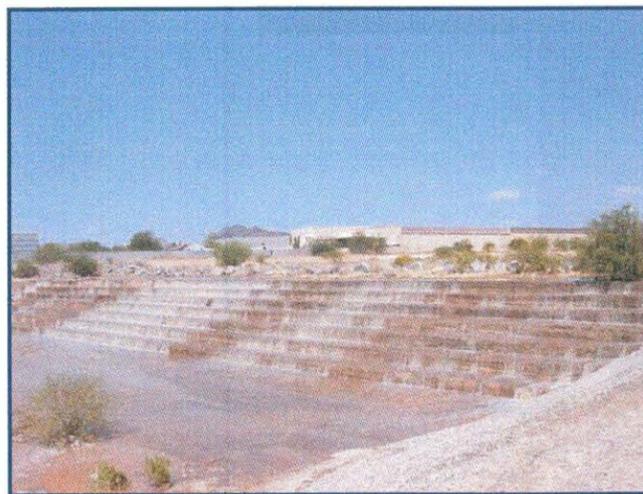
Skunk Creek Drop Structure (9-20-04)
